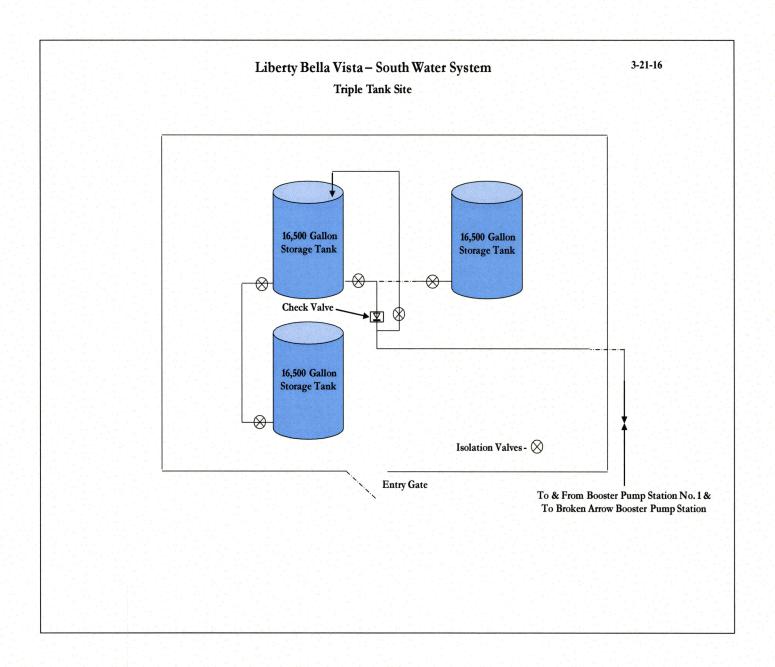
SOUTH WATER SYSTEM TRIPLE TANK SITE
